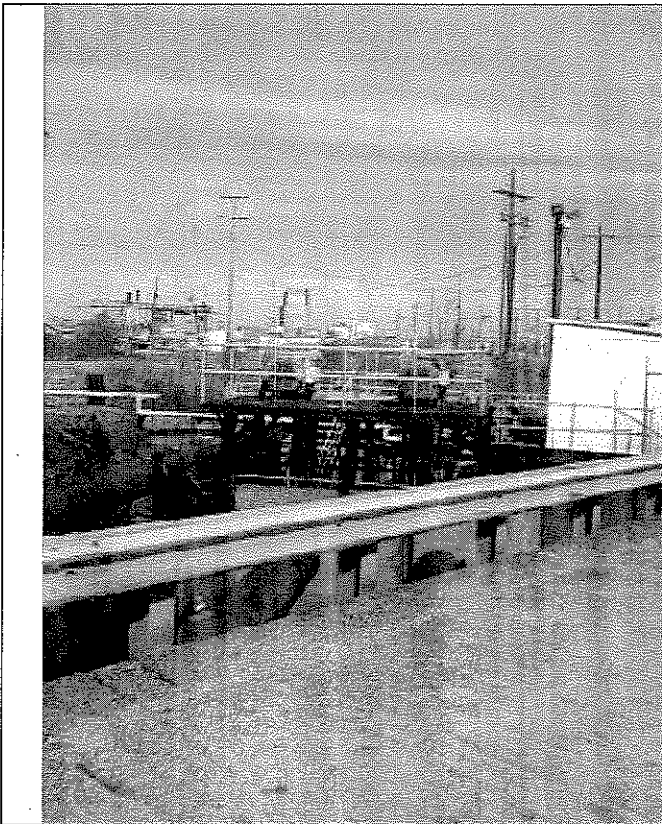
The stormwater pump station from bridge over Washoe Creek. Mill in the background
